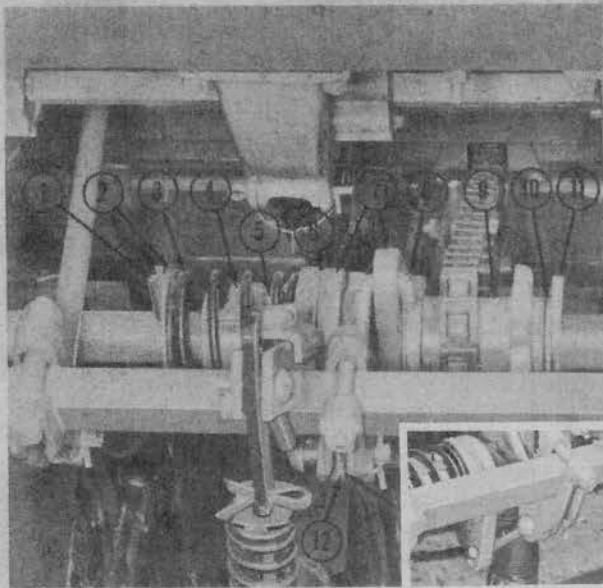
Grass Seed Drive with Inset Throw-Out Links
